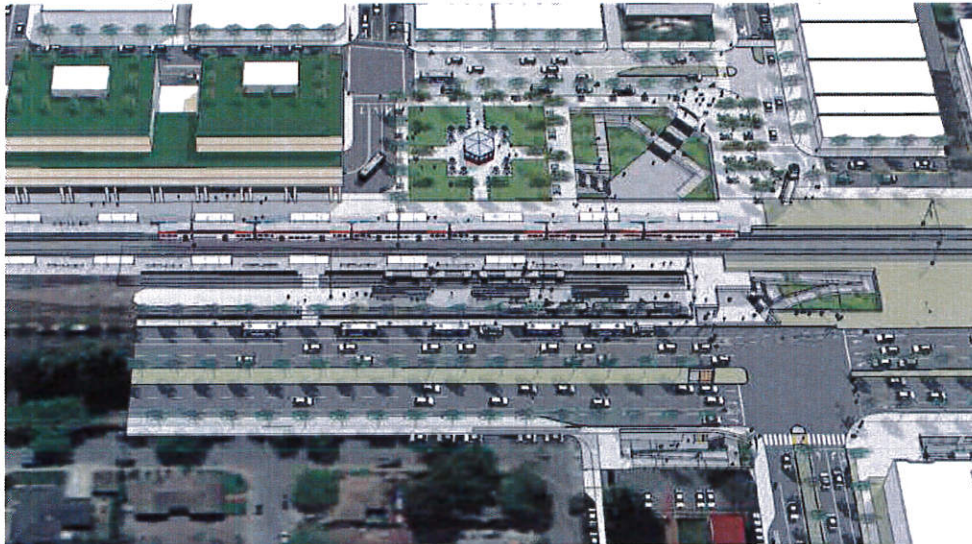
Rendering Perspective Looking South at the Mountain View Transit Center Master Plan
